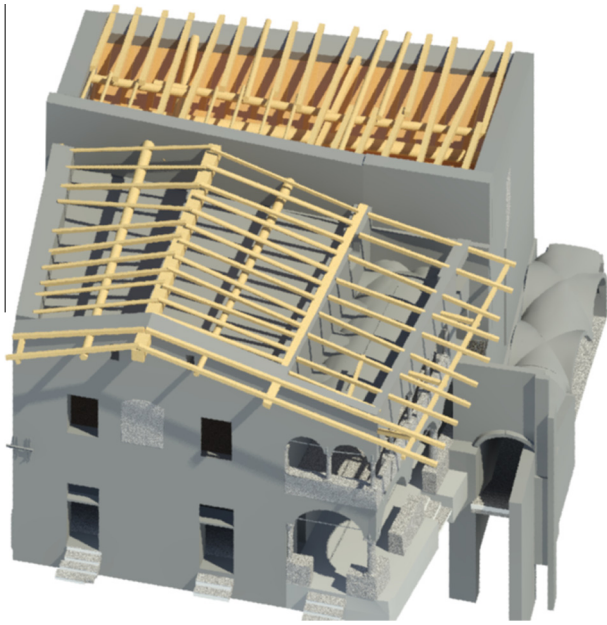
Some objects that were modeled with existing libraries are beams and trusses.
